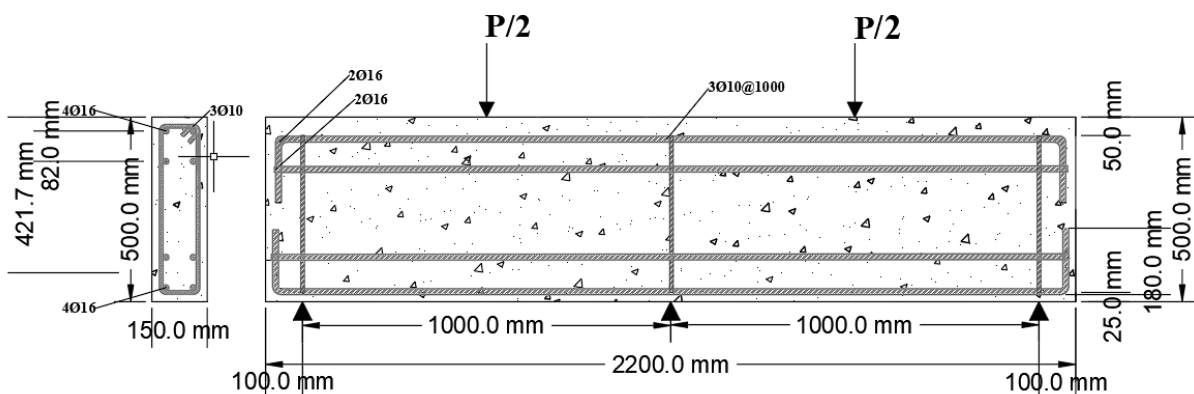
Special details (dimensions, reinforcement) of the control beam
